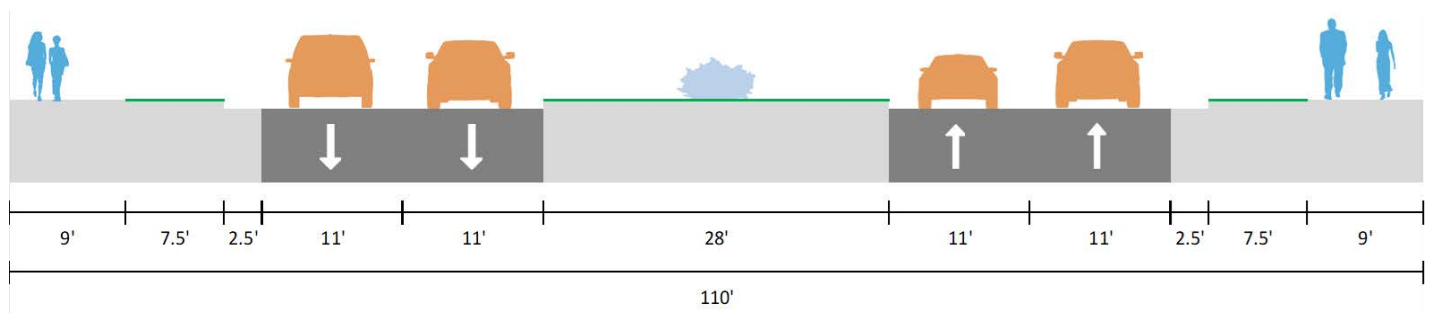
Collector, 4 Lane Section with On-Street Bike Lane
